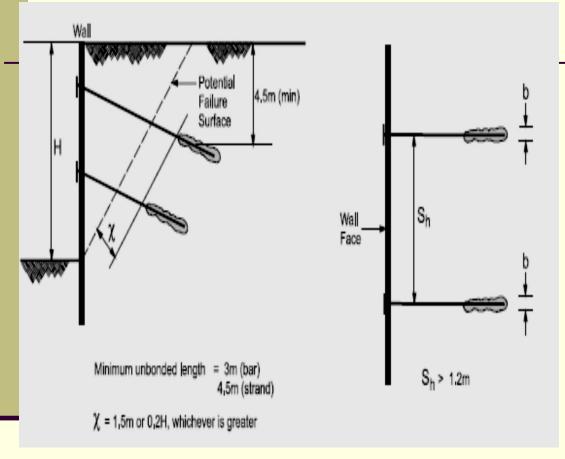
Vertical and horizontal spacing requirements for ground anchors.
